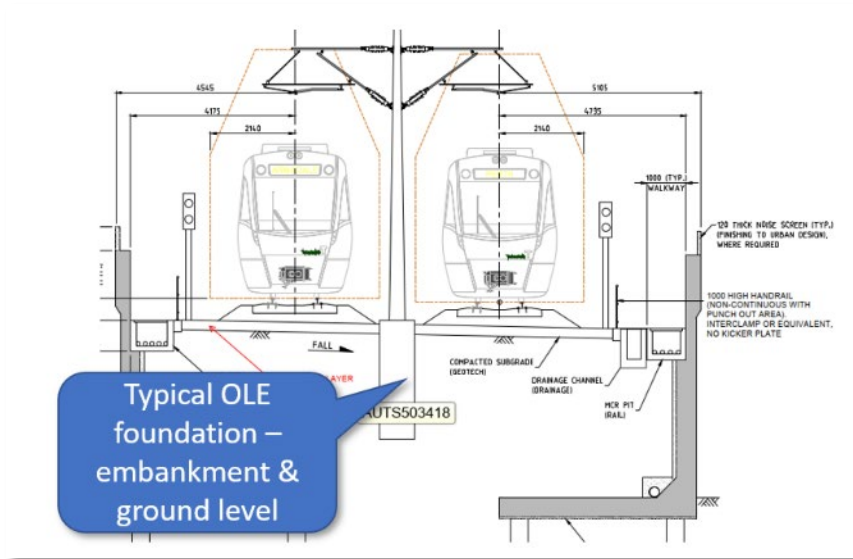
TYPICAL OLE FOUNDATION - GROUND LEVEL & EMBANKMENTS
